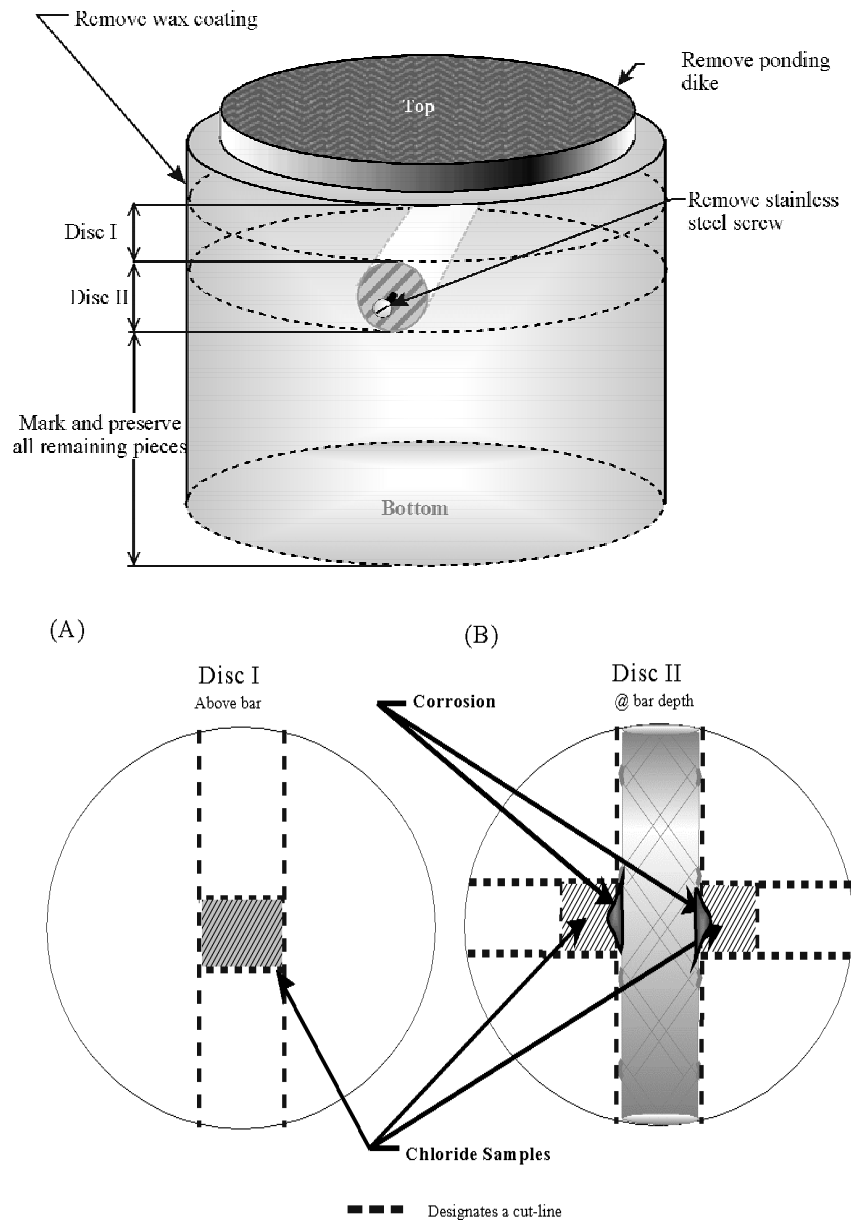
Post-cracking Sampling Plan for Laboratory Specimens
